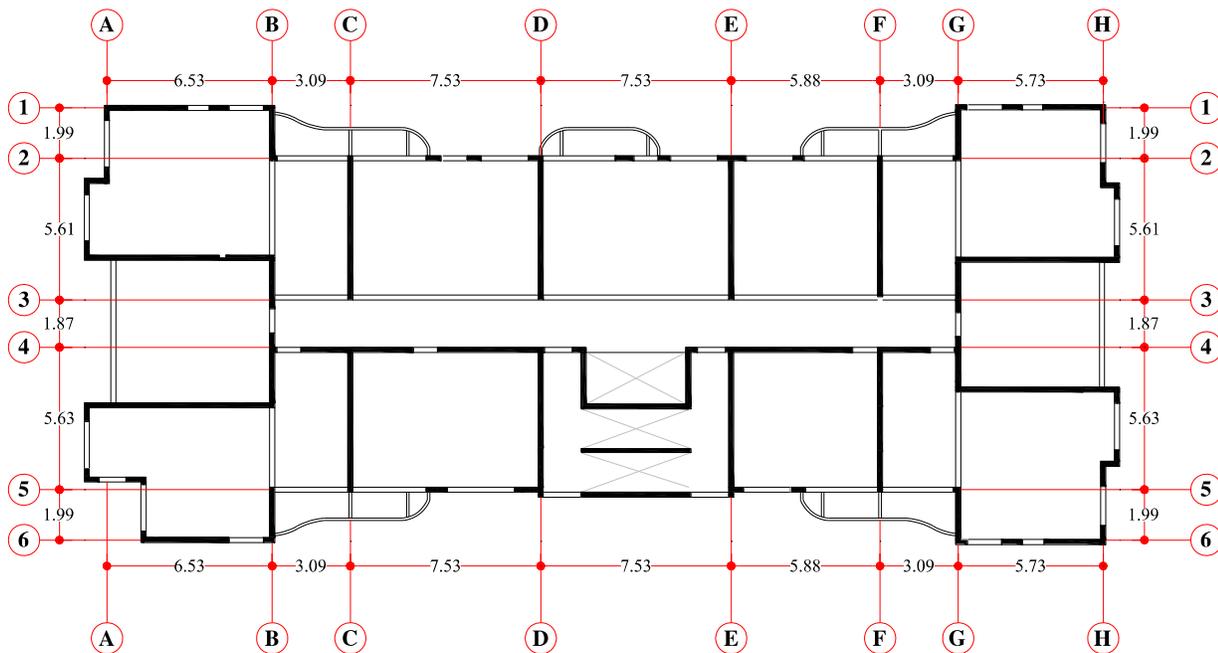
Plan view of a typical RC shear wall building in Chile (dimensions in meters)
